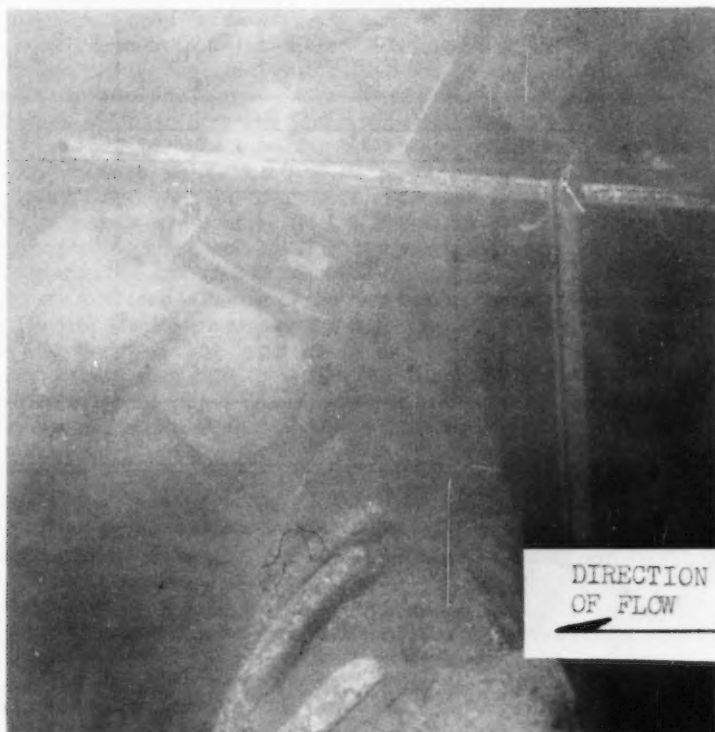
UNDERWATER PHOTOGRAPH SHOWING REINFORCING BARS IN END SILL BENT UPSTREAM.
